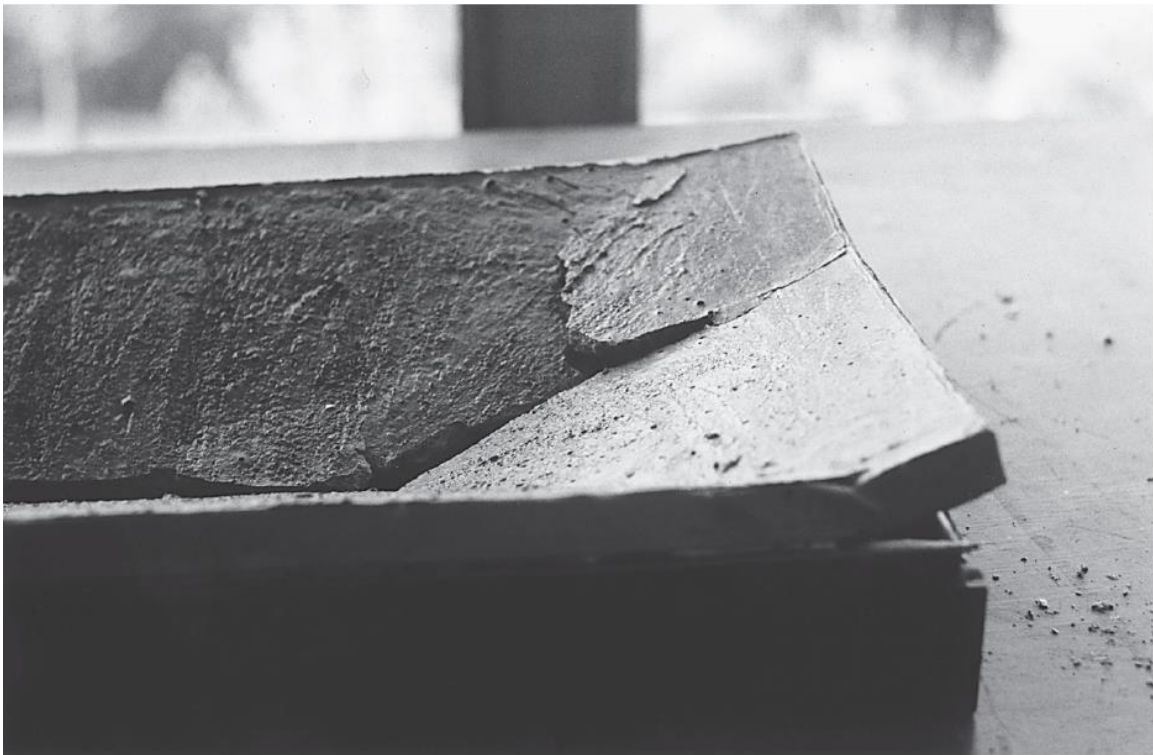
Corner crack of a simply supported beam under uniform transverse load.¹⁰
